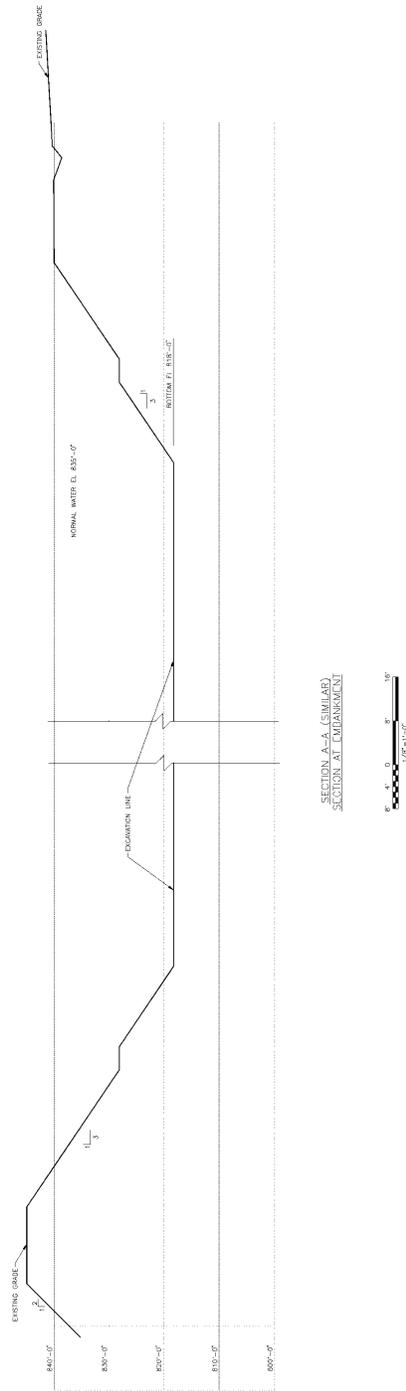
E.4-10—{Plant Arrangement -ESWEMS Pond Section at Embankment}
